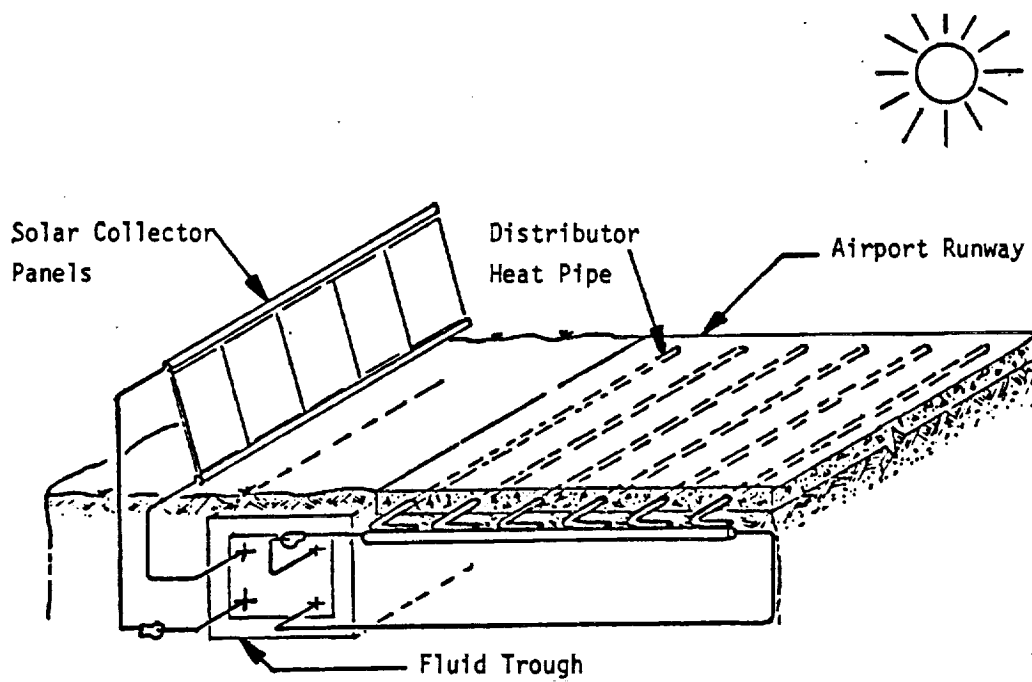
Solar powered airport runway heat pipe deicing system
